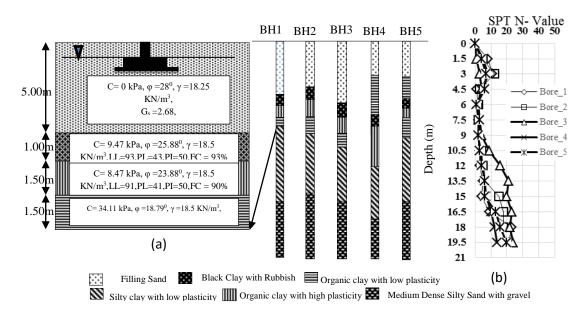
(a) Sub-soil strata below footing and (b) Borelogs and SPT N-values of reclaimed
